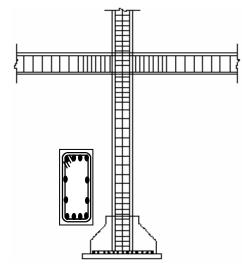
Detailing of C3 column as per IS 13920:1993
